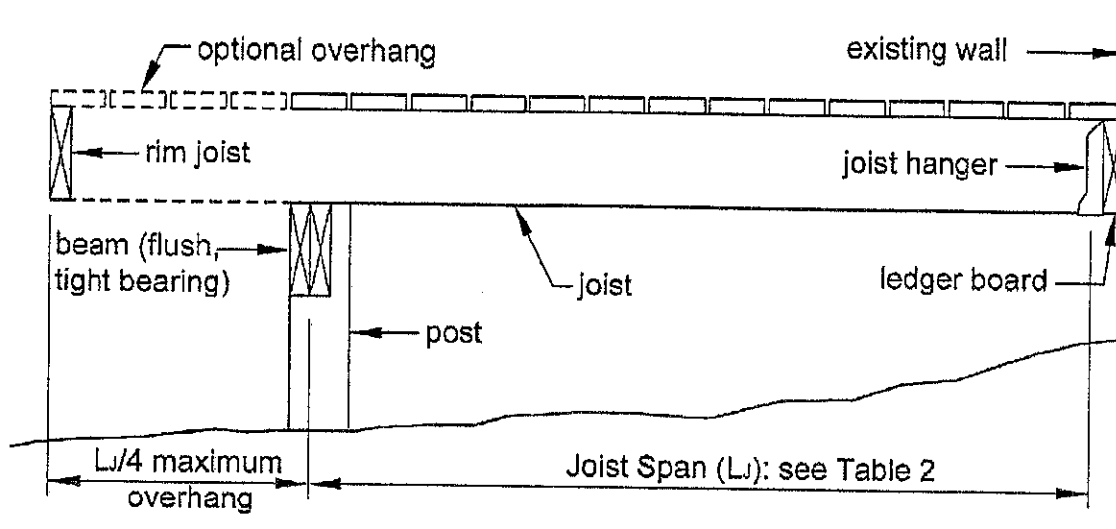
B: Joist Span – Joists Attached at House and to Side of Beam
